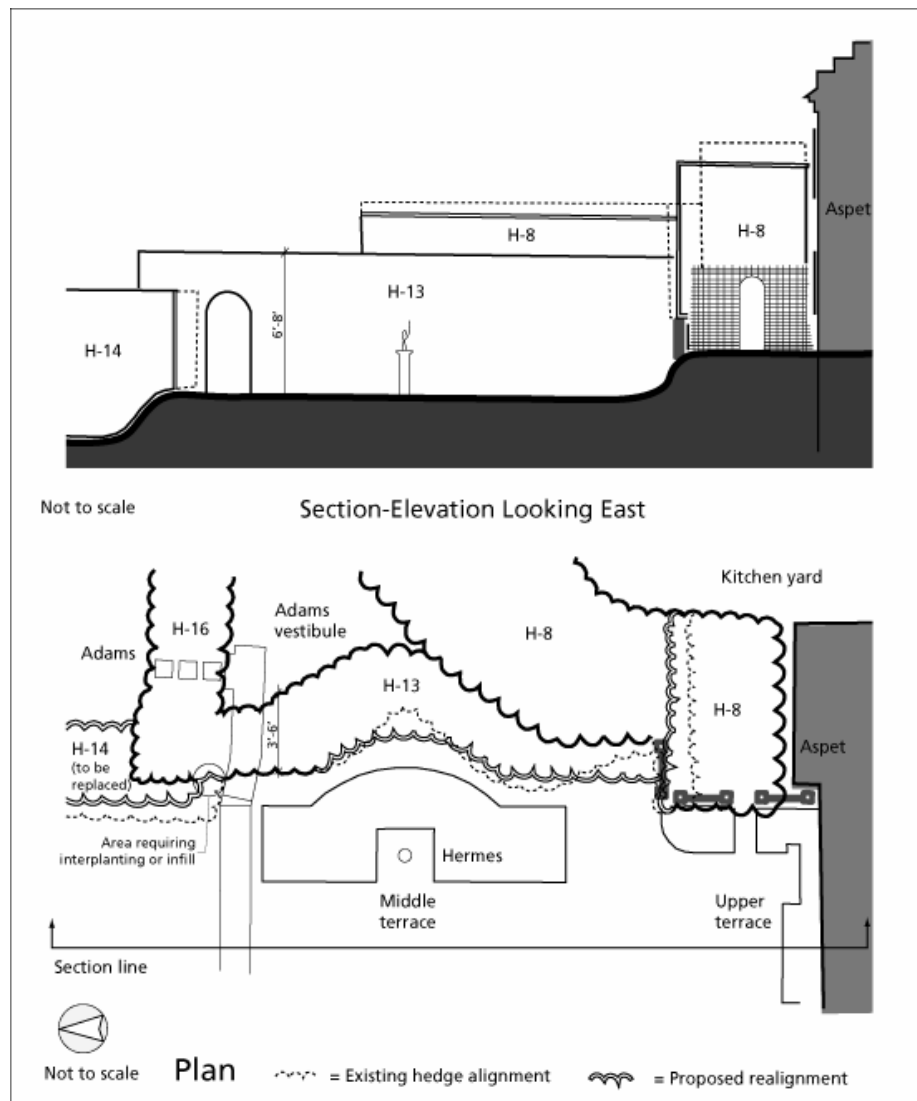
Plan and section-elevation detail of intersection of kitchen and terrace garden hedges showing proportional relationships (SUNY ESF).
